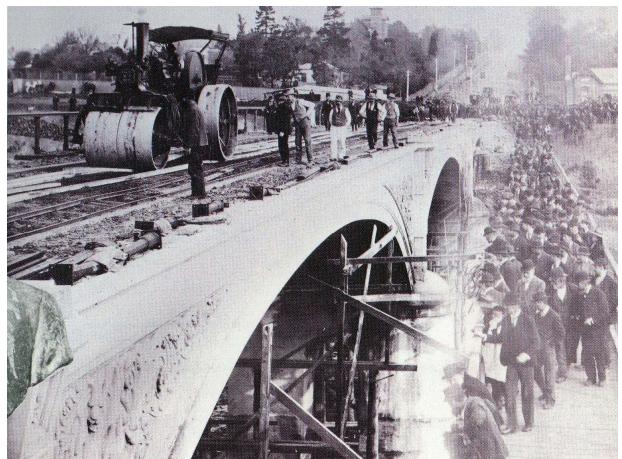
Load-testing of the Morell Bridge in 1899 (looking south). National Trust
